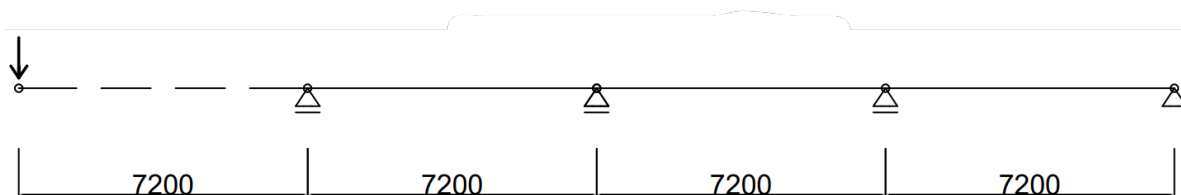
Corner column removed, single span beams supported by hinged connections
